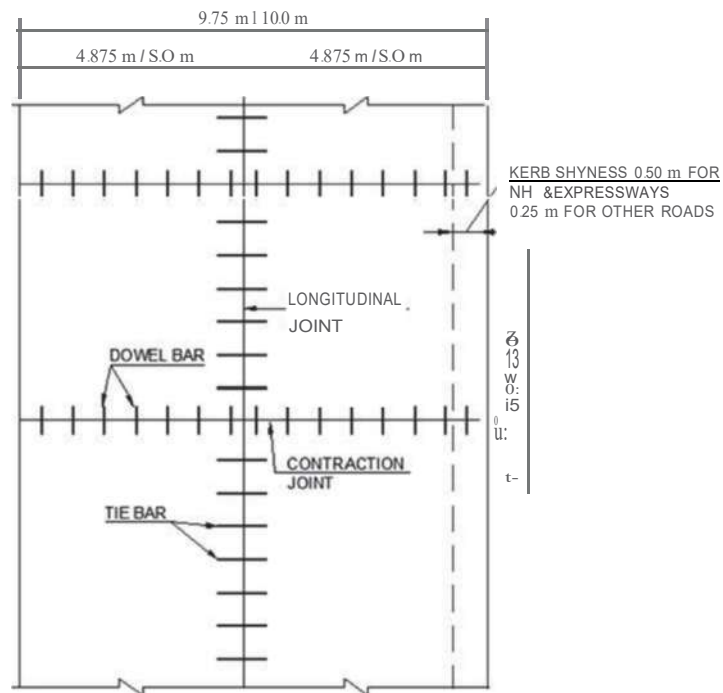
Alternate Joints Configuration for each Carriageway of Four Lane Divided Road (Half Cross-Section)
